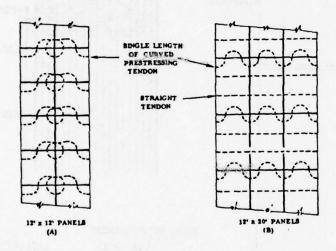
Plan View of Biaxial Compression Joining of Panels by Prestressing Tendons (Ref. 50).
